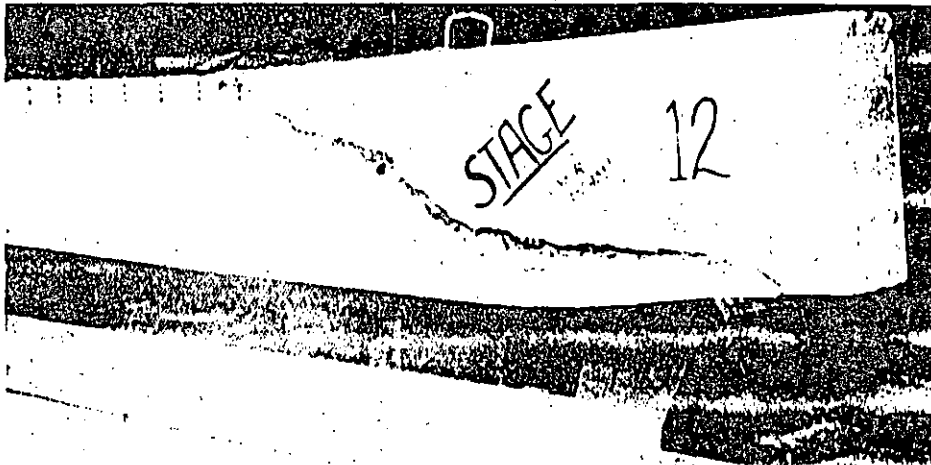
Principal diagonal tension crack at failure of beam in the preceding photograph (load stage 12).
